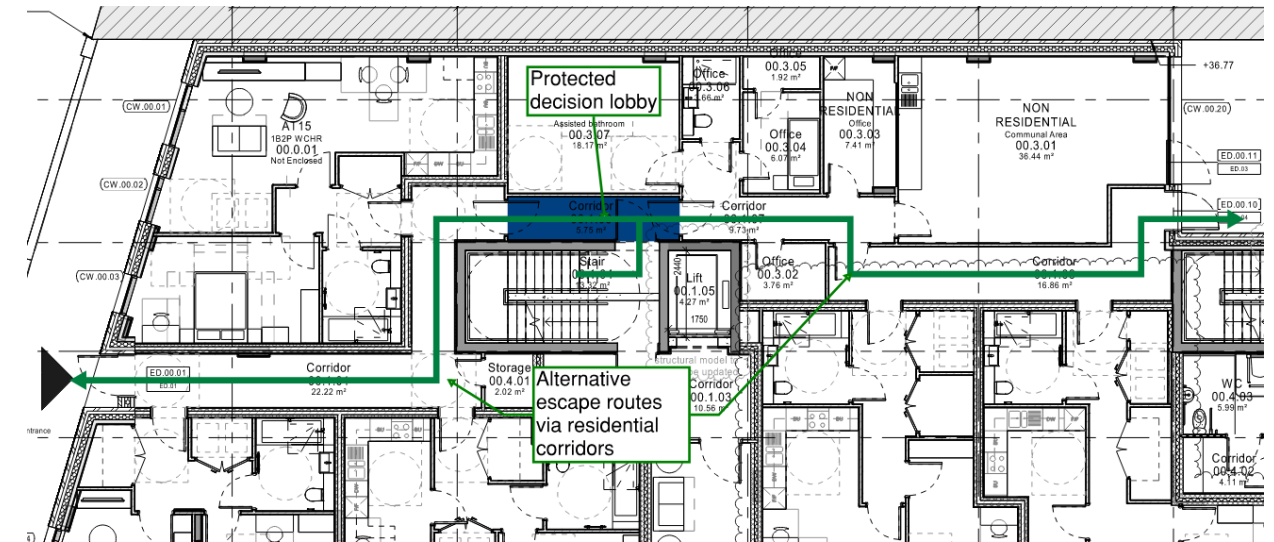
Final Exits from Sections of Core A Serving Basement Level
